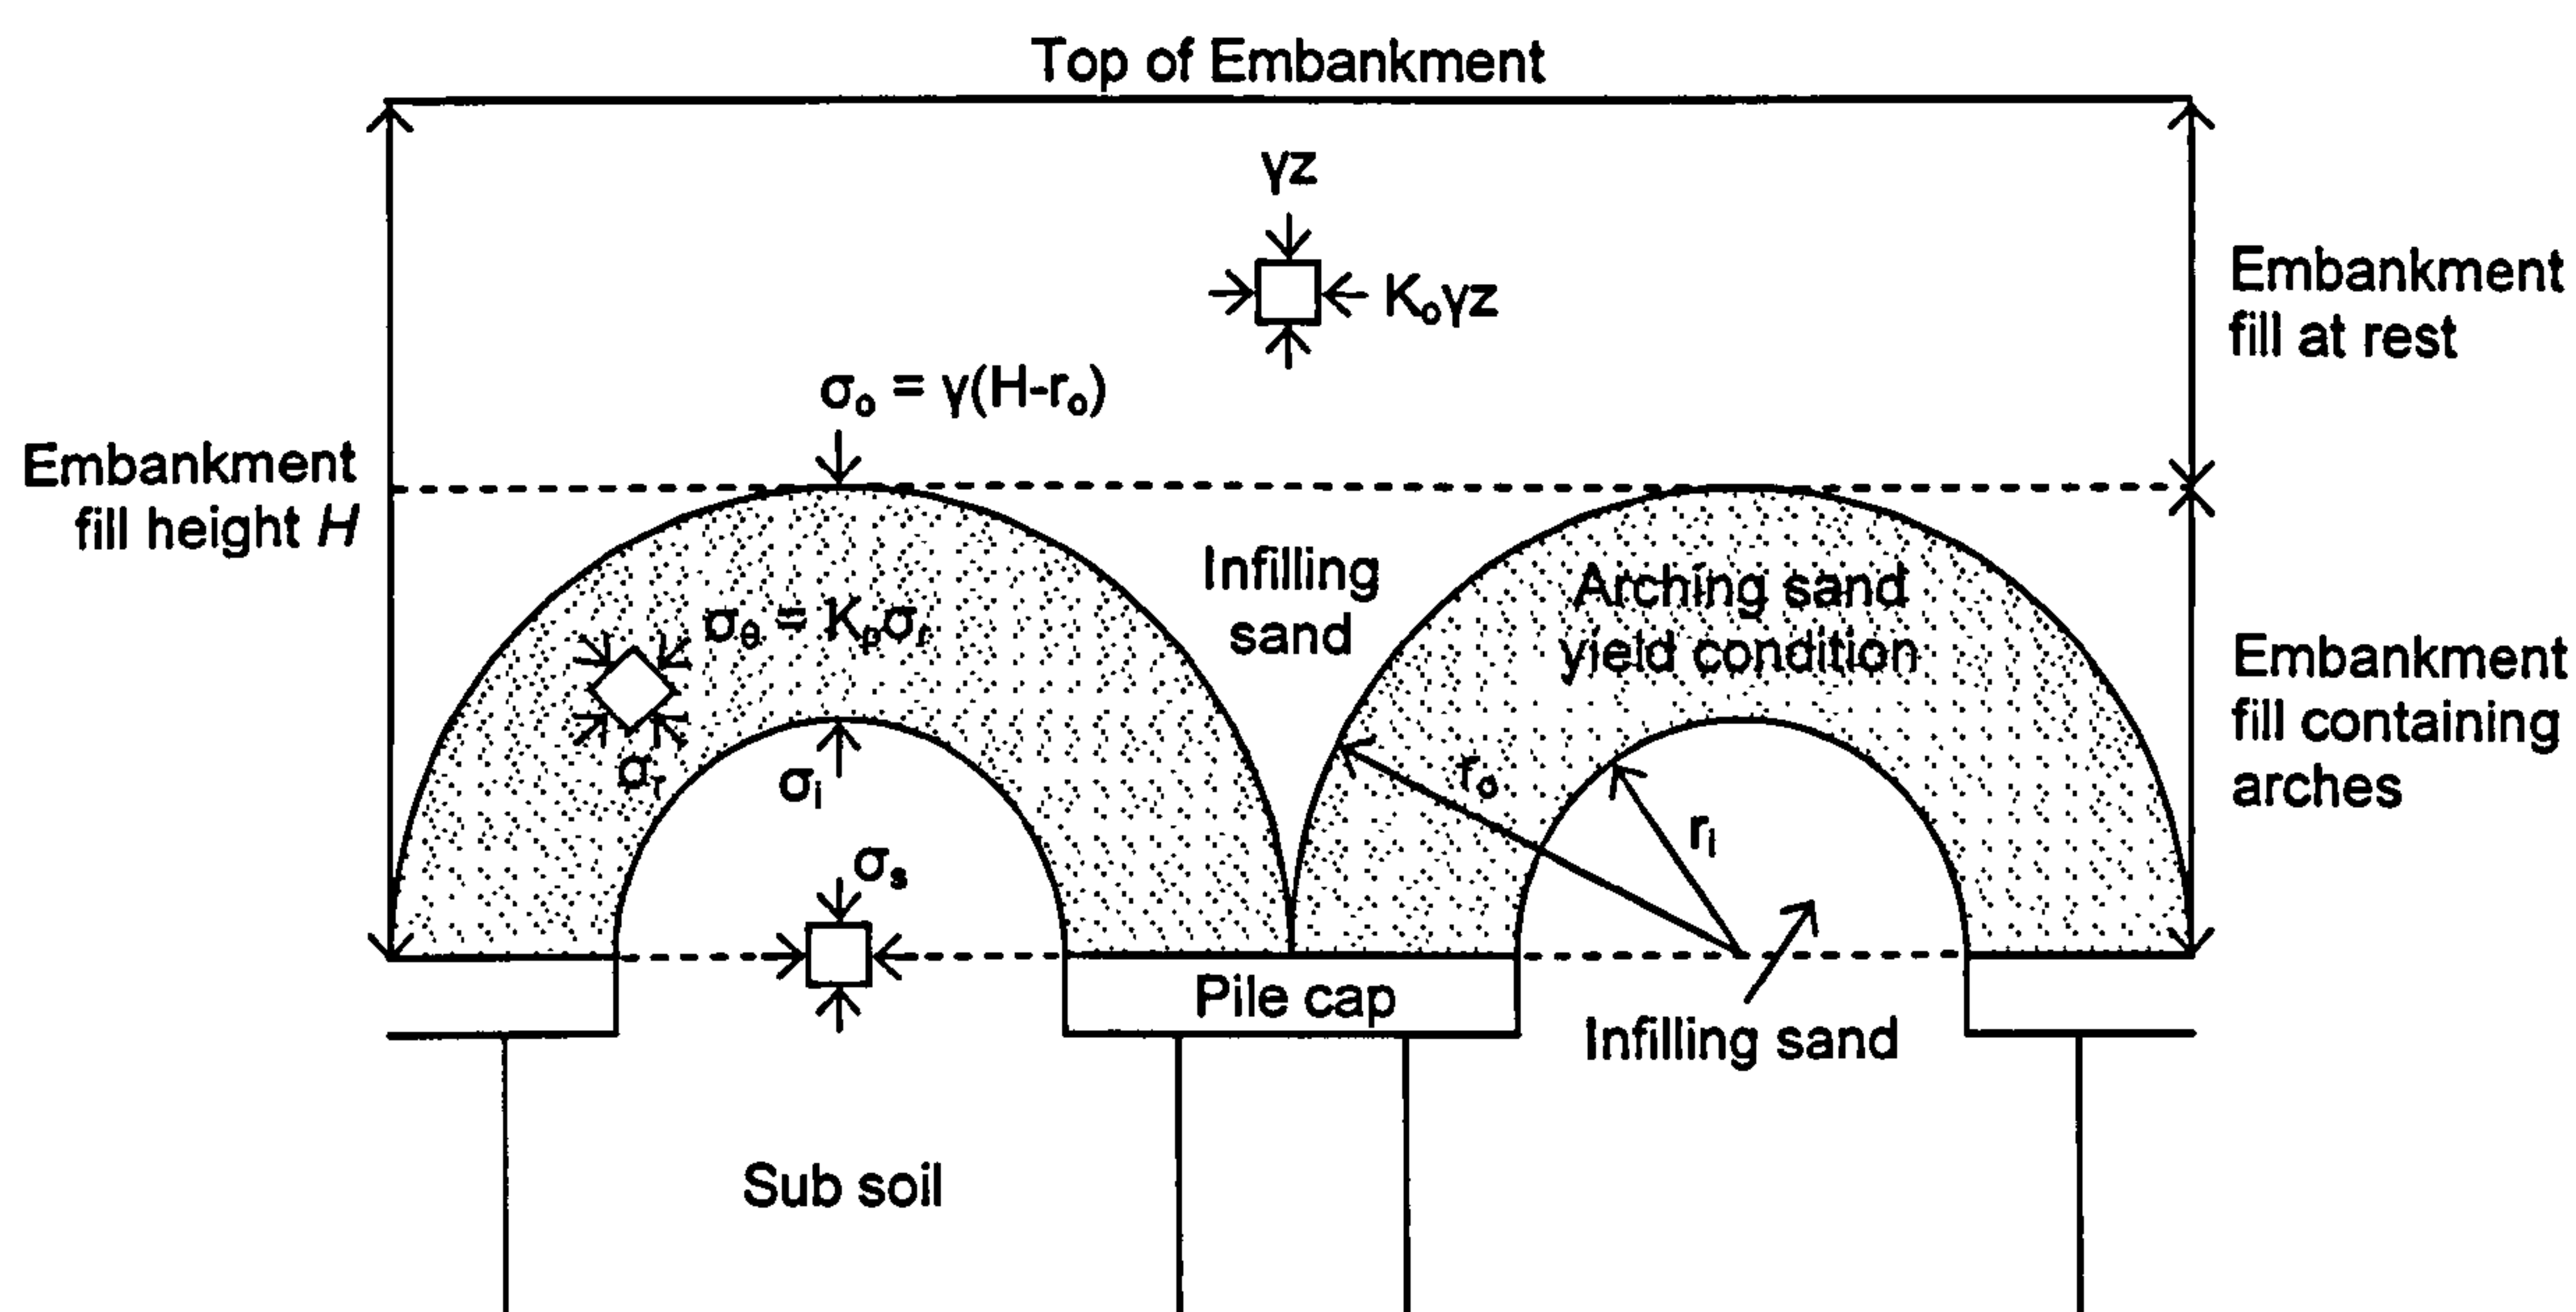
Section through a piled embankment (Hewlett & Randolph, 1984)
